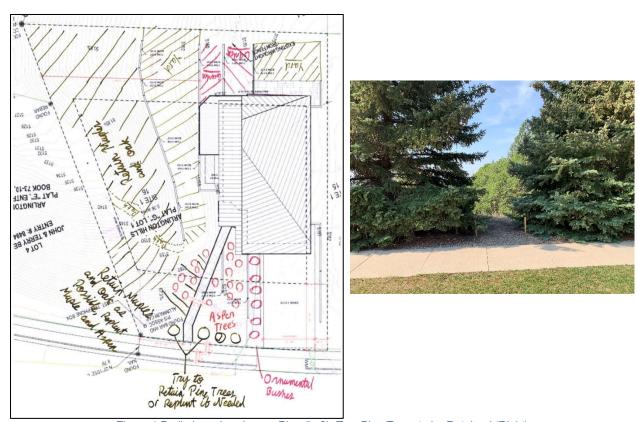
Preliminary Landscape Plan (Left); Two Pine Trees to be Retained (Right)
